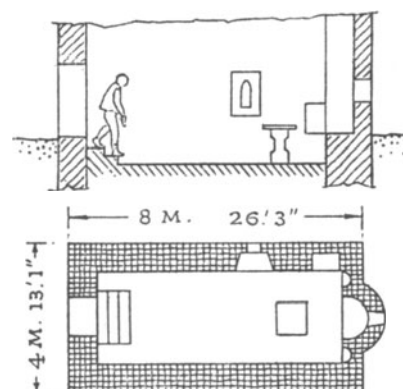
CHURCH AT TRNOVA PETKA. Section and plan
